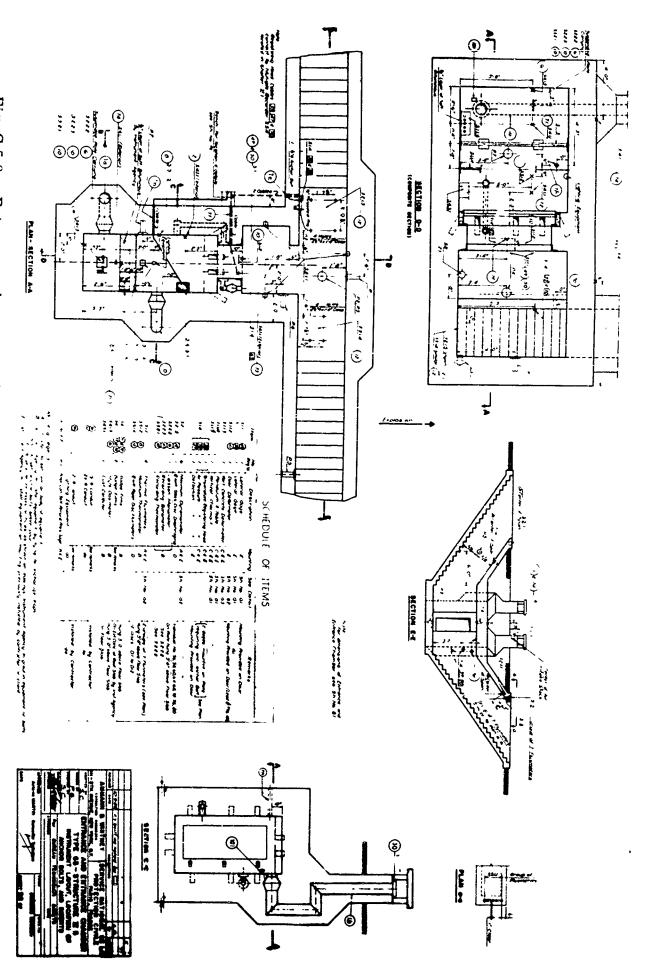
Entrance and entrance chamber, type 65, structure 5, reinforcement at door location F1.
